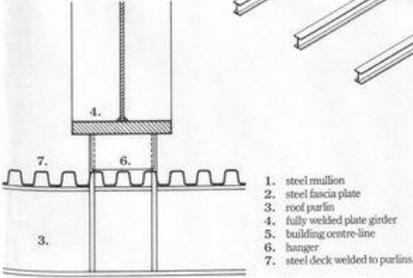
Detail of the connection between the main beam and the suspended purlins.
